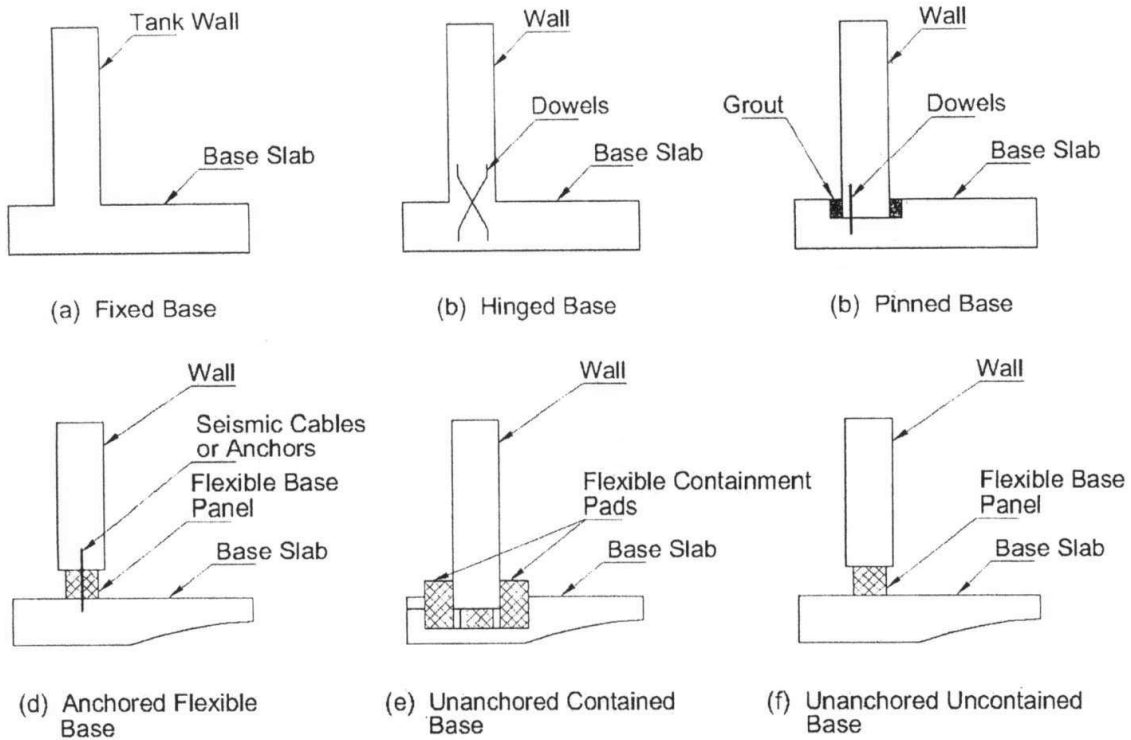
TYPE OF CONNECTIONS BETWEEN TANK WALL AND BASE SLAB
